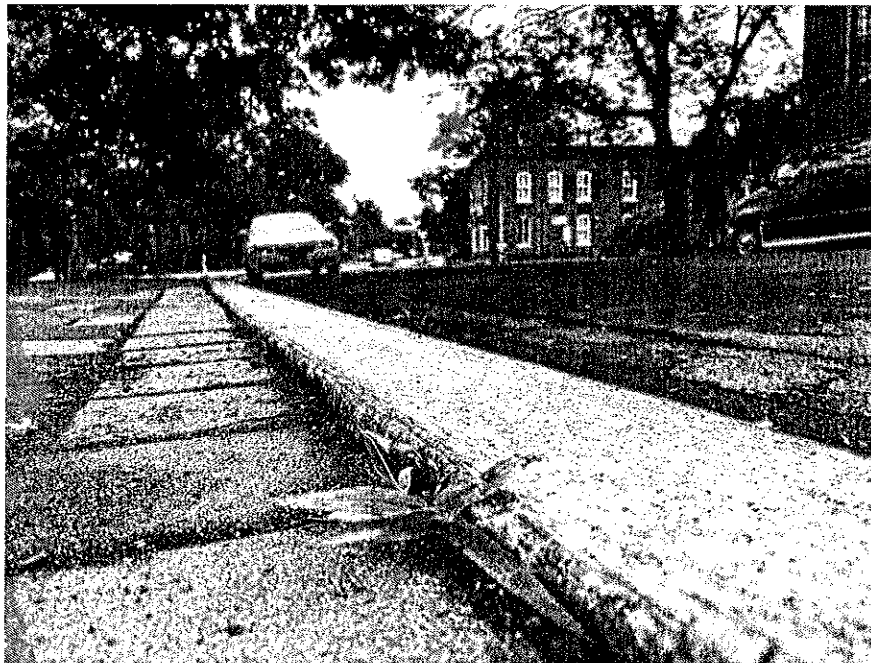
Representative photo of trip hazard at curb where sidewalk pavers have settled. This differential settlement also causes ponding of storm drainage on sidewalk surface.
